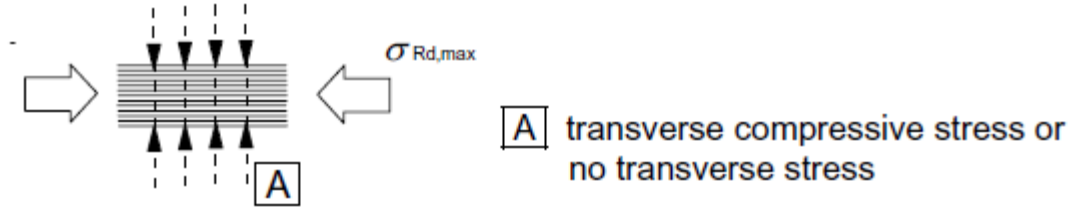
Design strength of concrete strut (no transverse tension)
